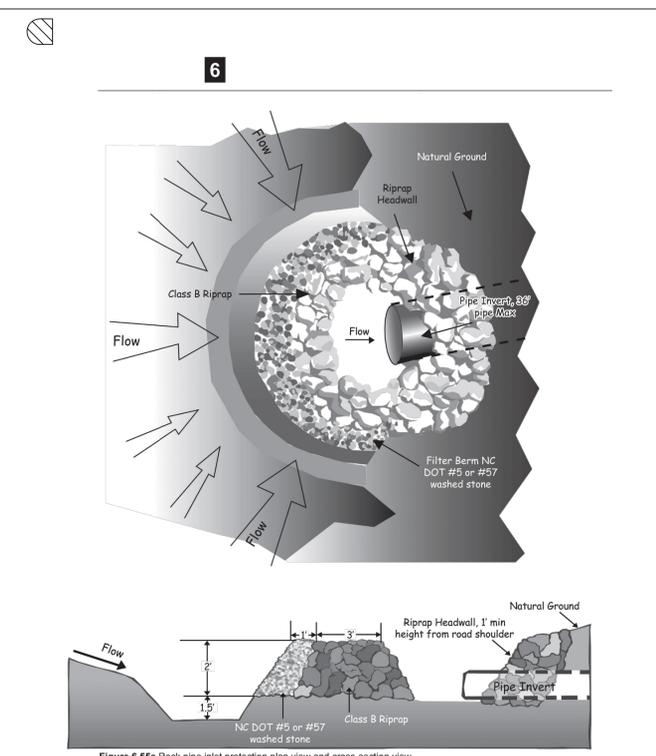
Rock pipe inlet protection plan view and cross-section view
